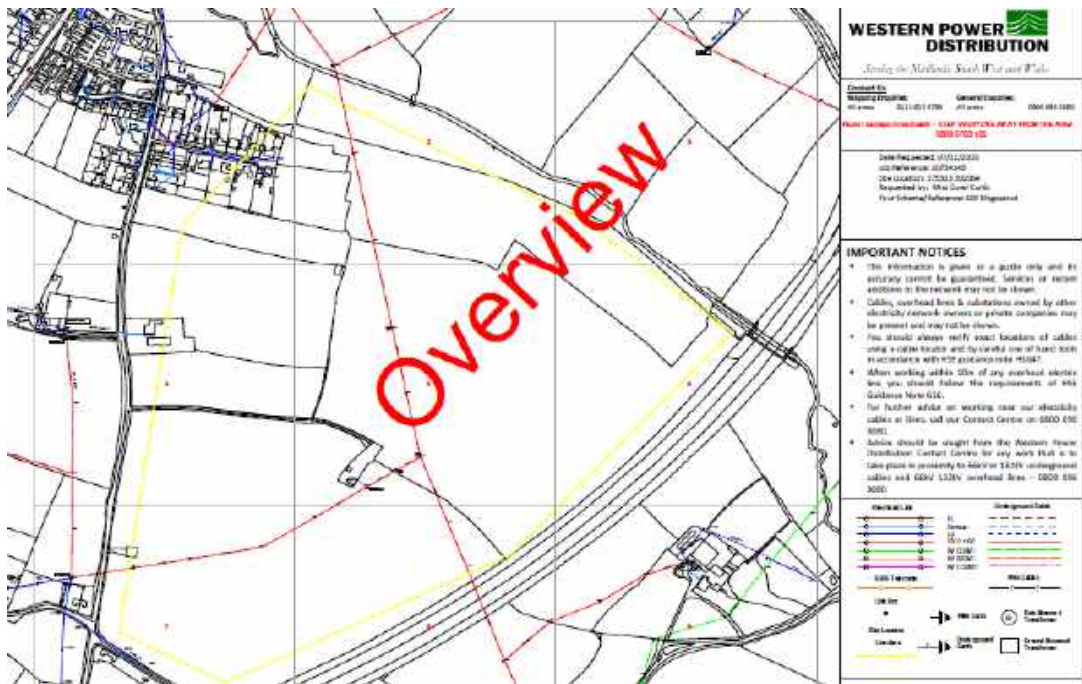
Extract of WPD showing overhead lines / underground cables owned by WPD (red line)
